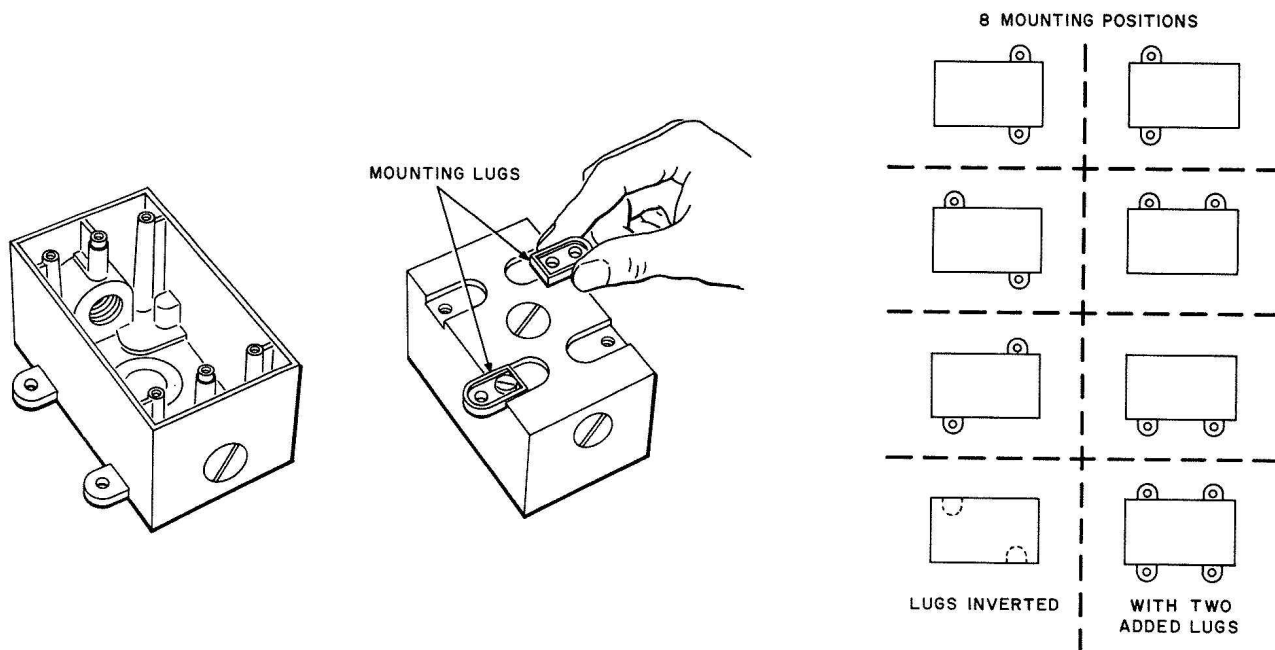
Outlet Box Showing Reversible Mounting Lugs
